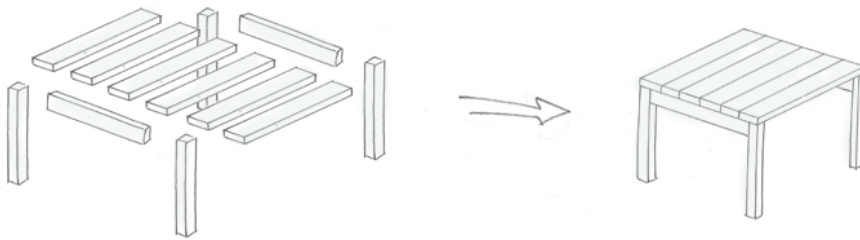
Each subset contains floor plates, beams and columns in the configuration shown above.
